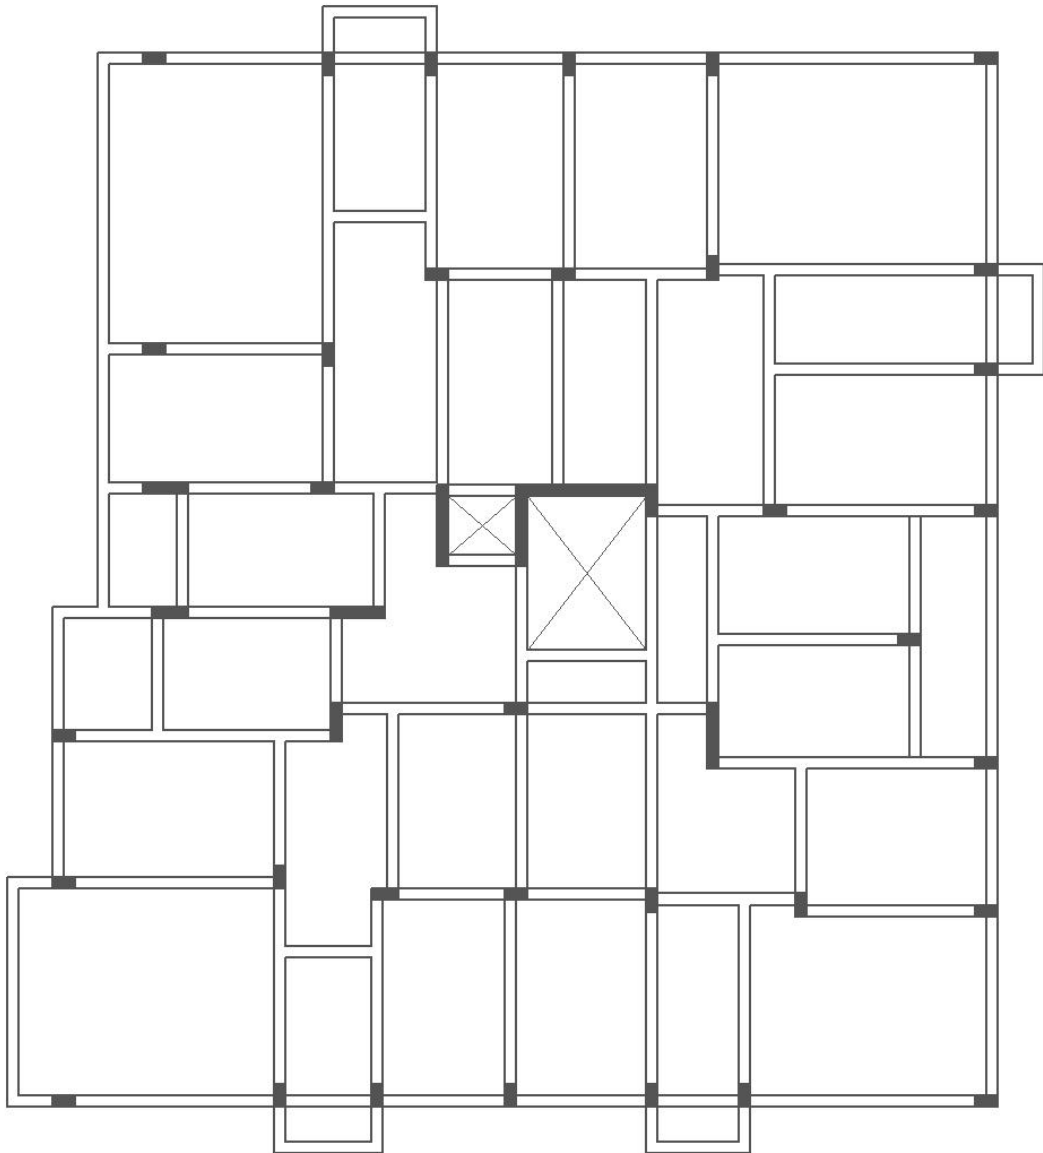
Structural Plan of Model-3 with Irregular Structural System
